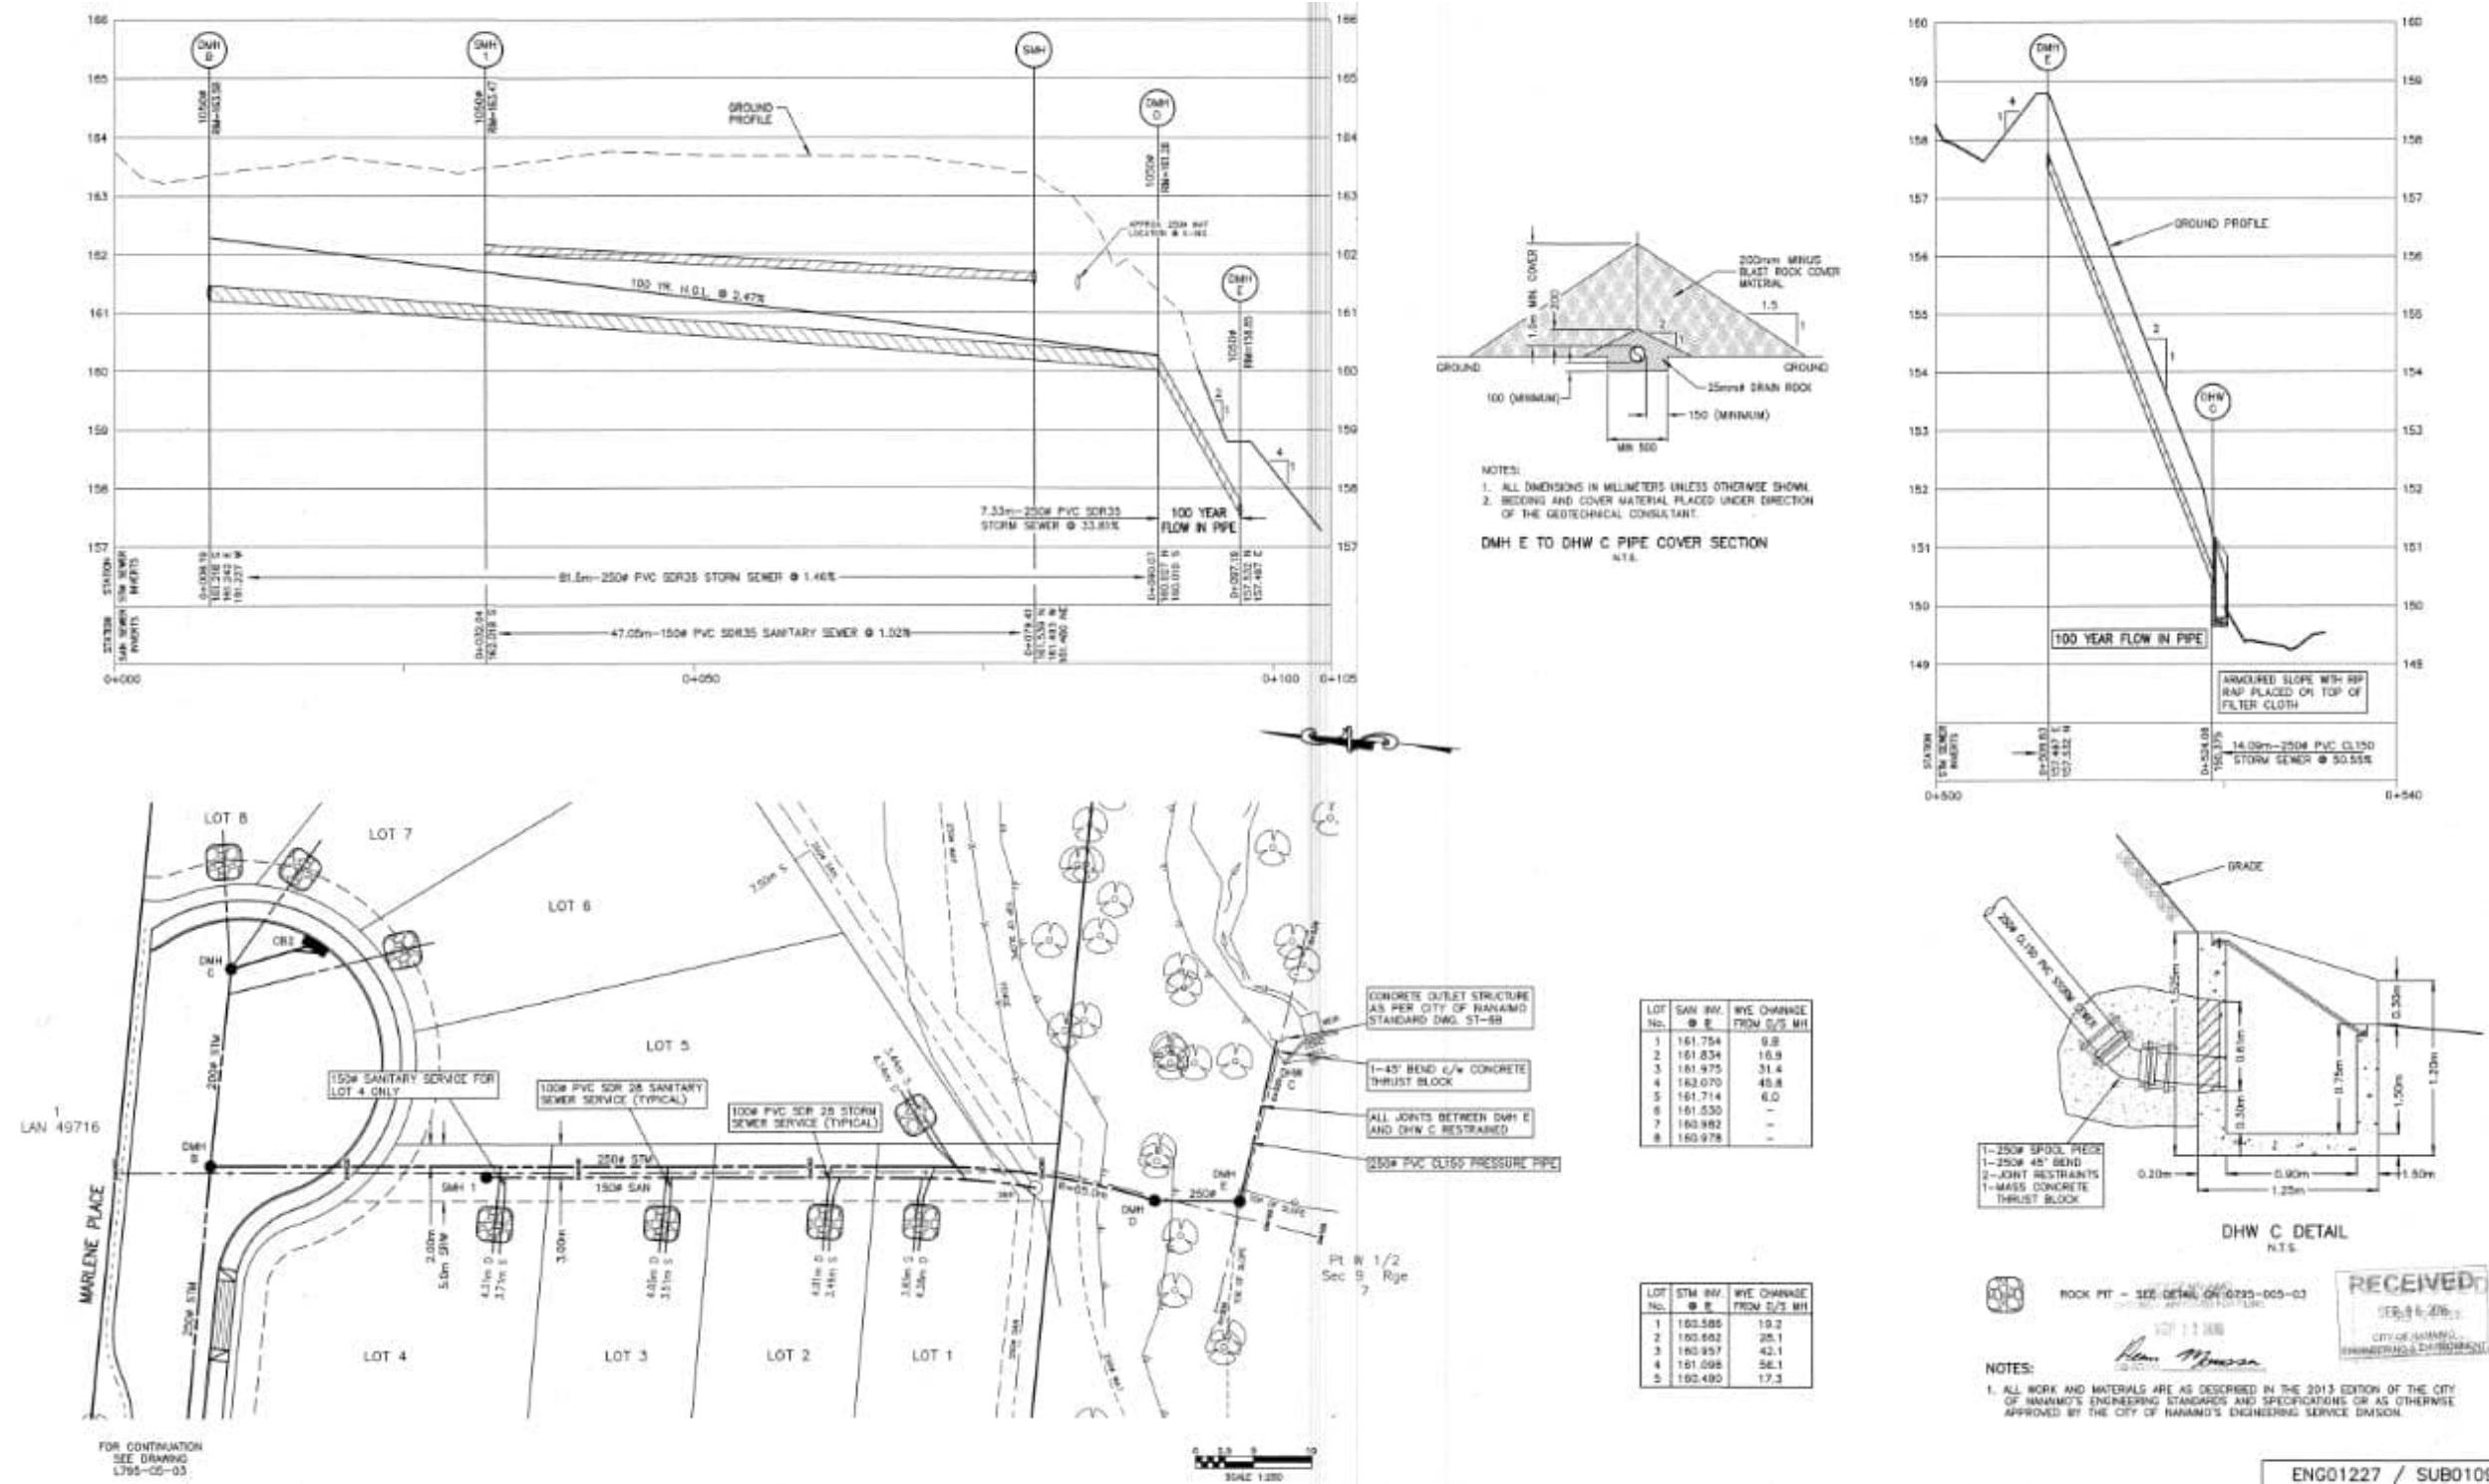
Cross Sections of Storm and Sanitary Sewers at Westwood Lake Dams
